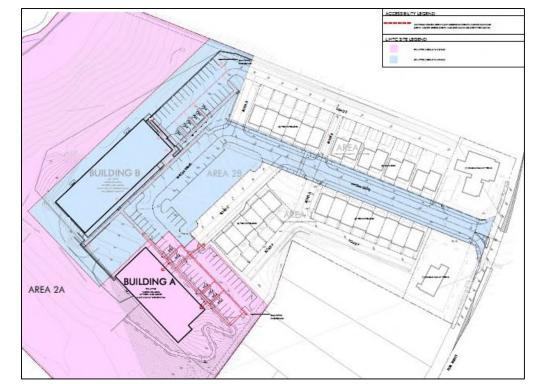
Site Plan, 1025-A and 1025-B Park Street
